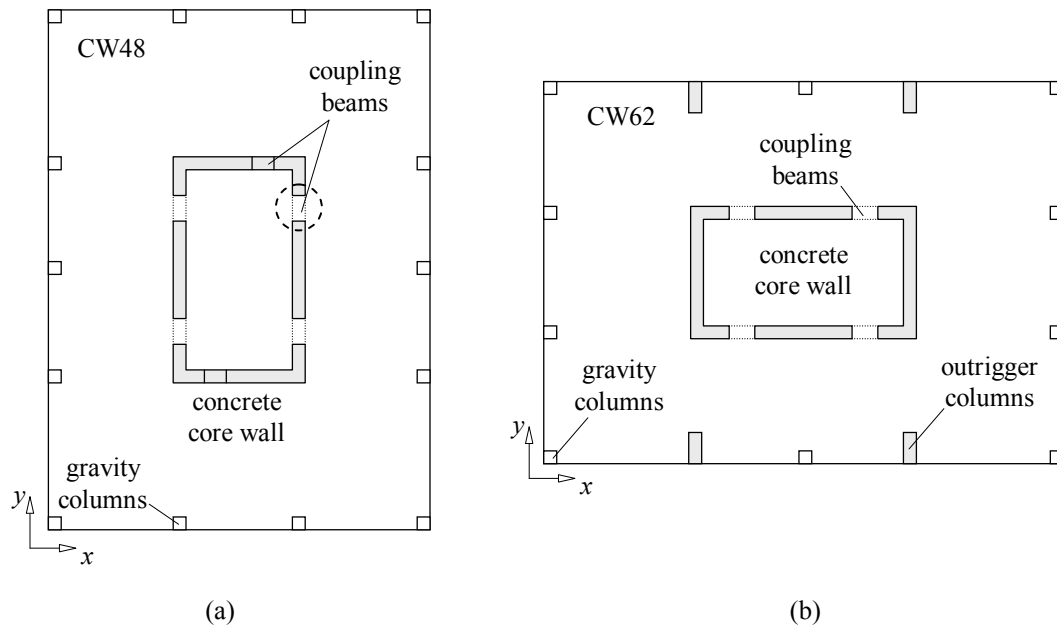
Schematic plans: (a) CW48 building; (b) CW62 building.
